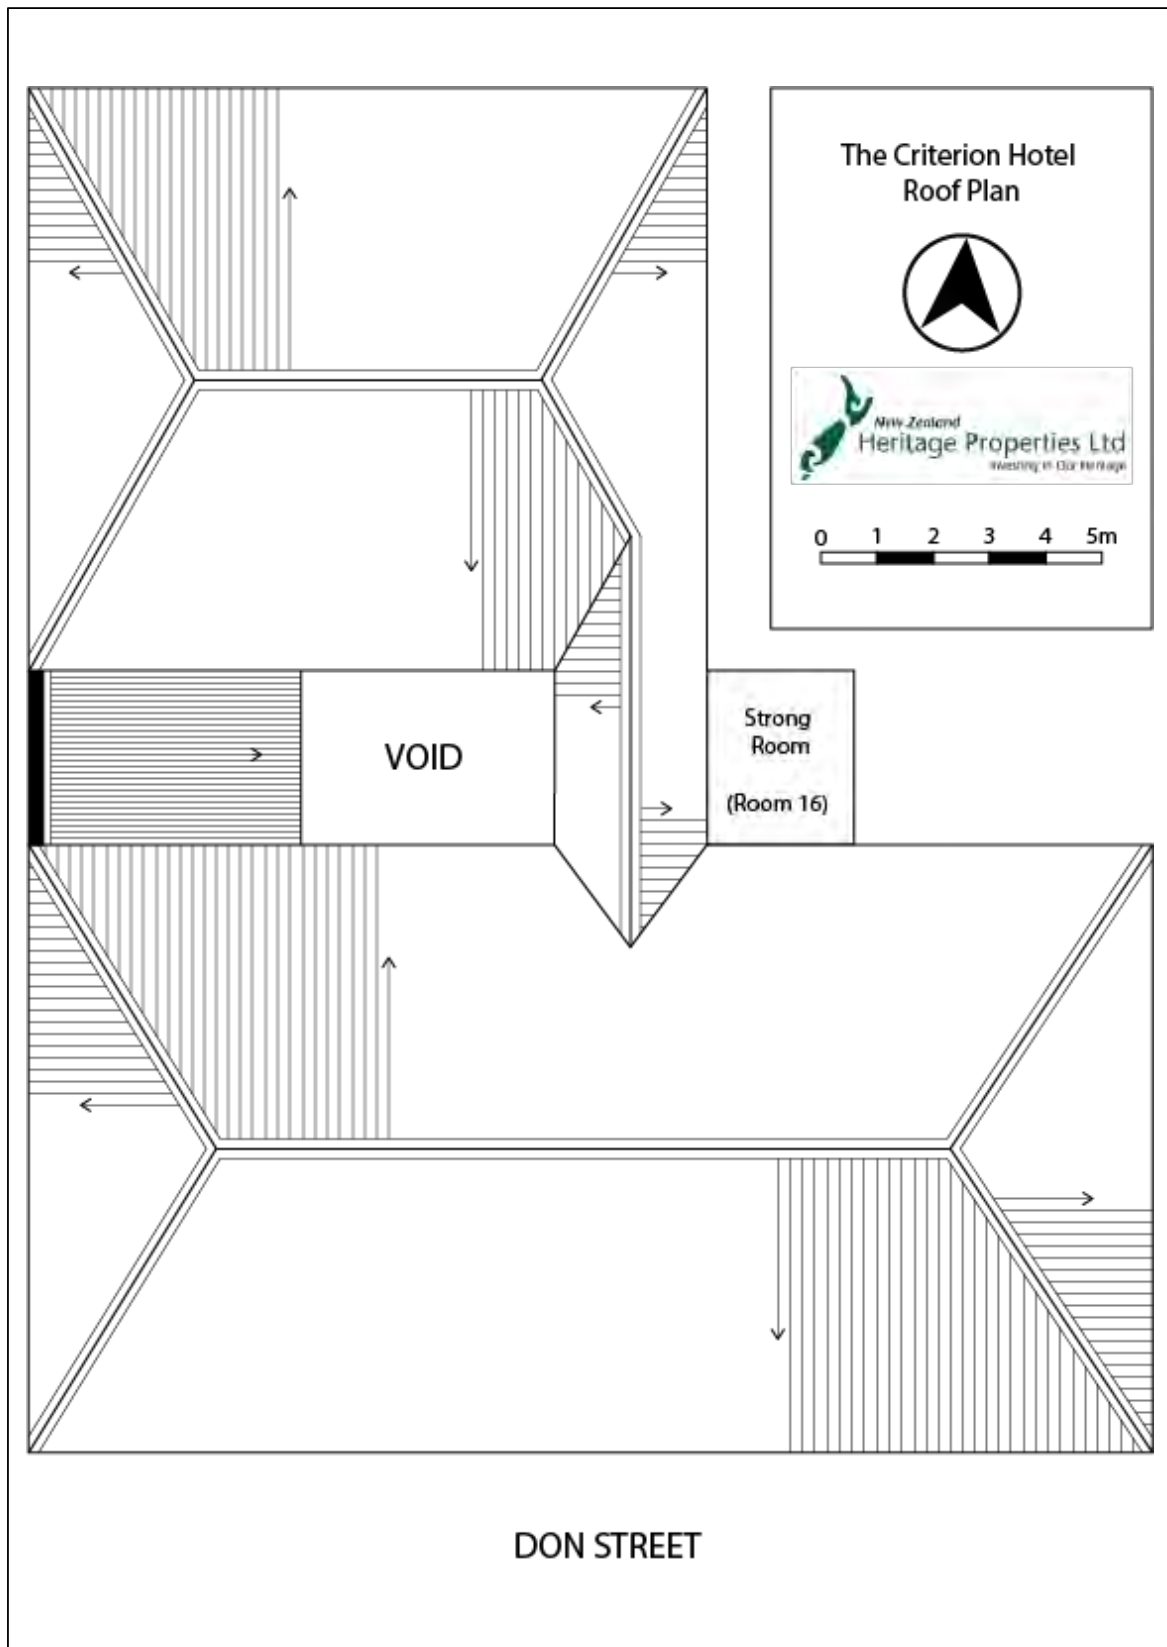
Roof plan for the Criterion Hotel, arrows indicate the downward slope of the roof sections.
